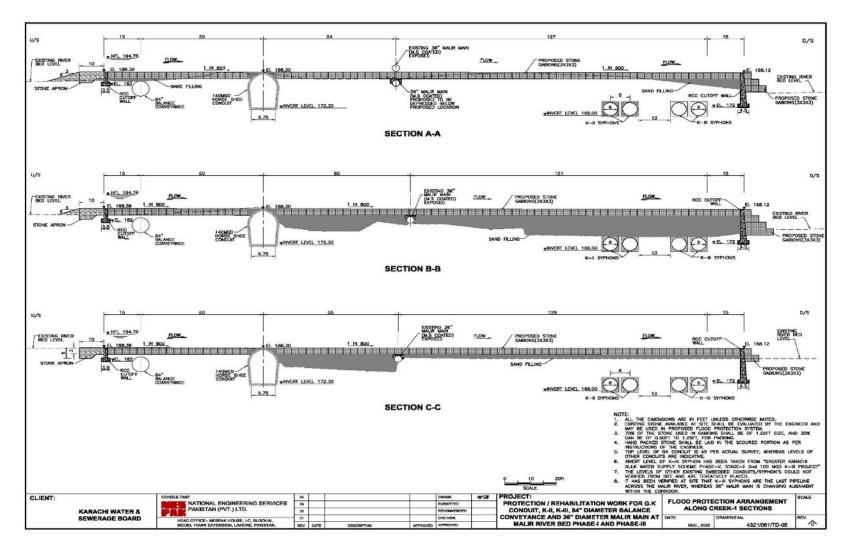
Flood Protection Arrangement along Creek-1 Section & Details
